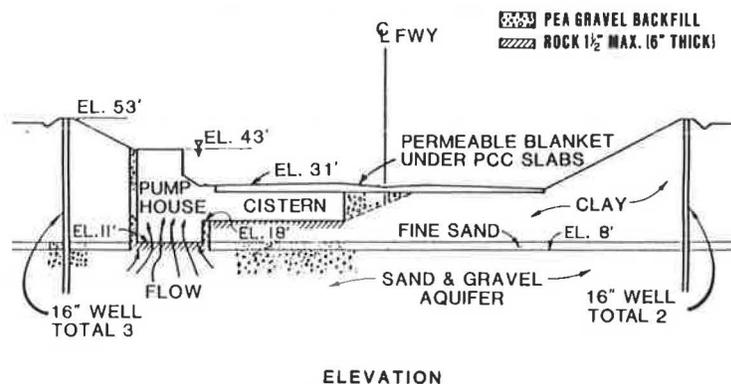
San Jose 10th Street Pump House, U.S. 101 (looking north).
